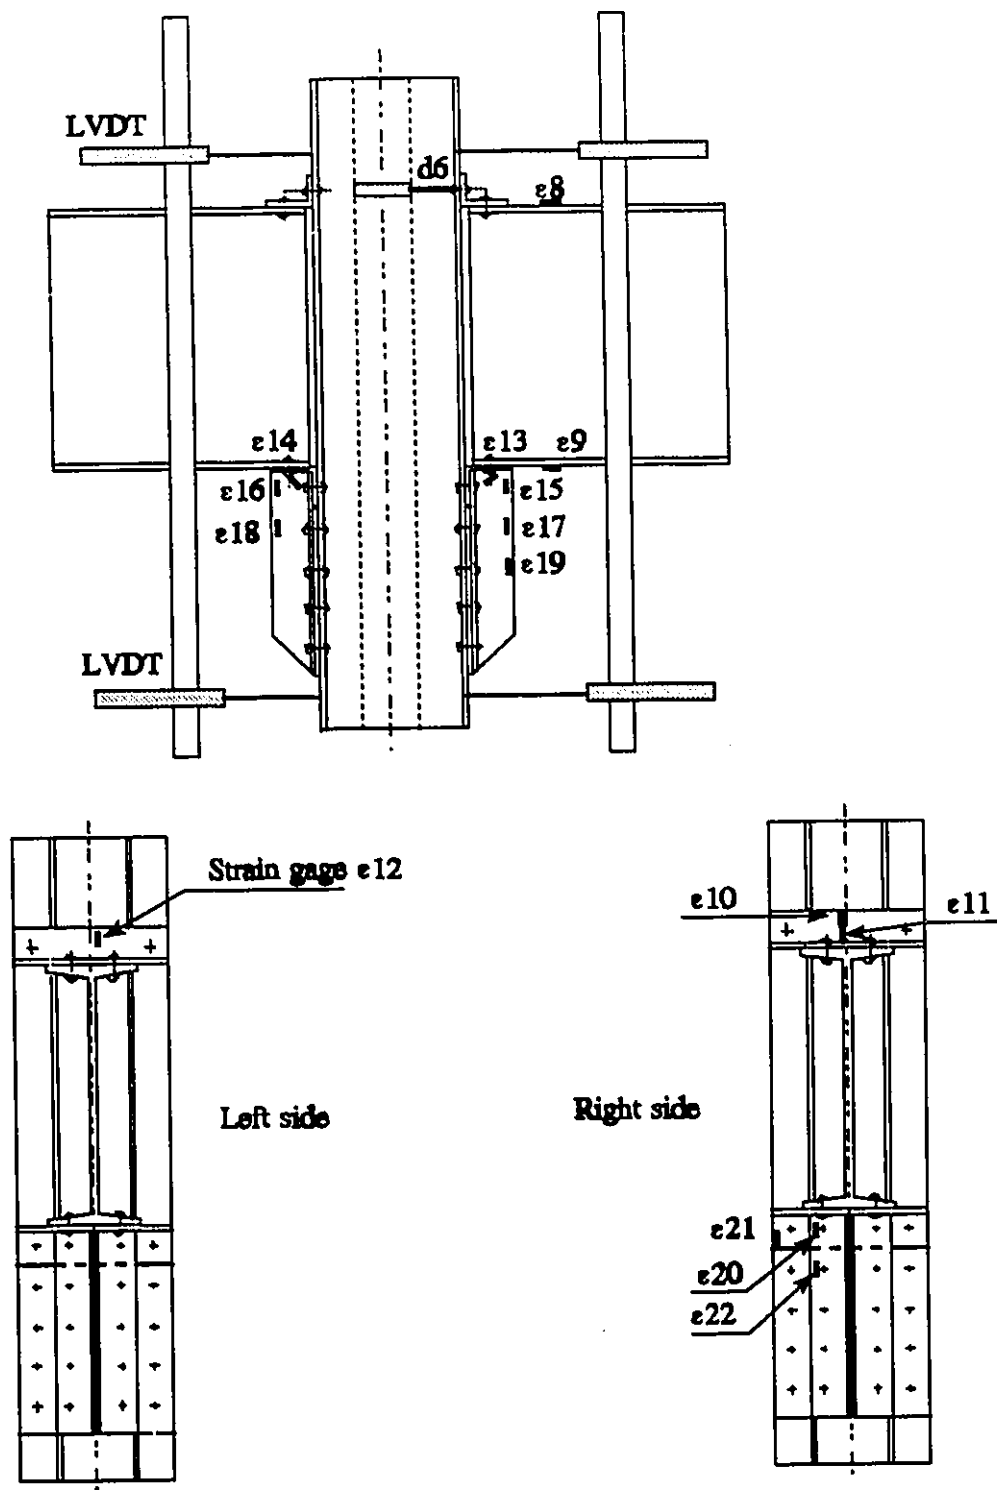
Location of strain gages in connection detail 2 (Specimen 4)
